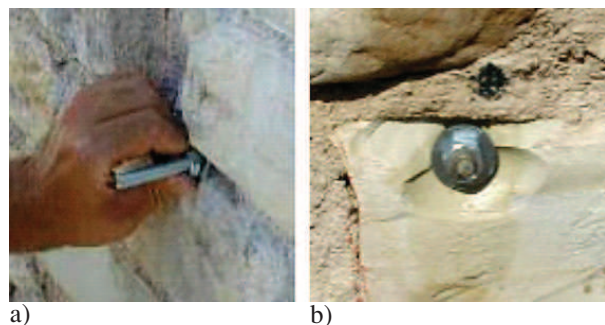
Strengthening interventions, positioning of stainless steel threaded bars used as ties: a) fixing of the nut; b) external aspect of the strengthened wall
